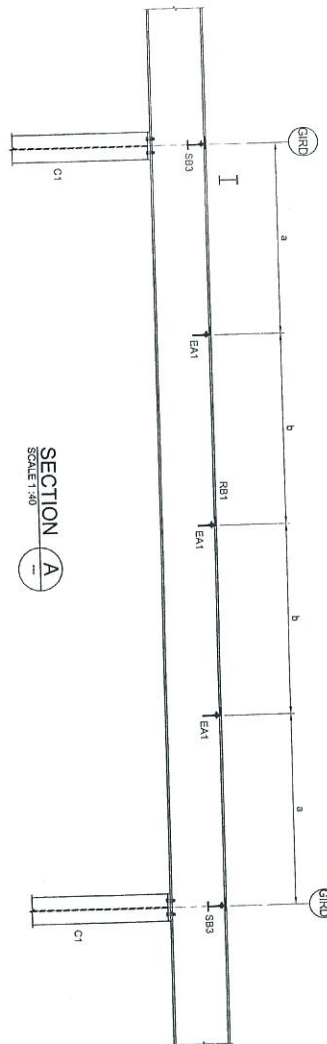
DETAIL OF CRANE GIRDER CG2, CG3, CG4, CG5 AND CG6 (PLAN - T.O.S.=EL9.825)
